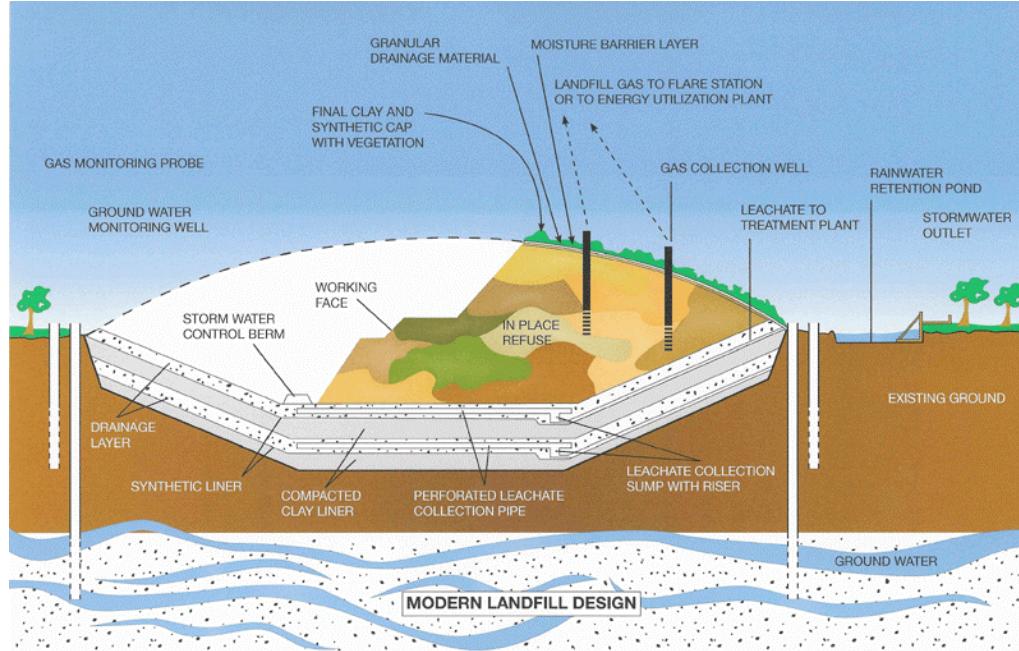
Landfill cross-section [www.runcoenv.com]
